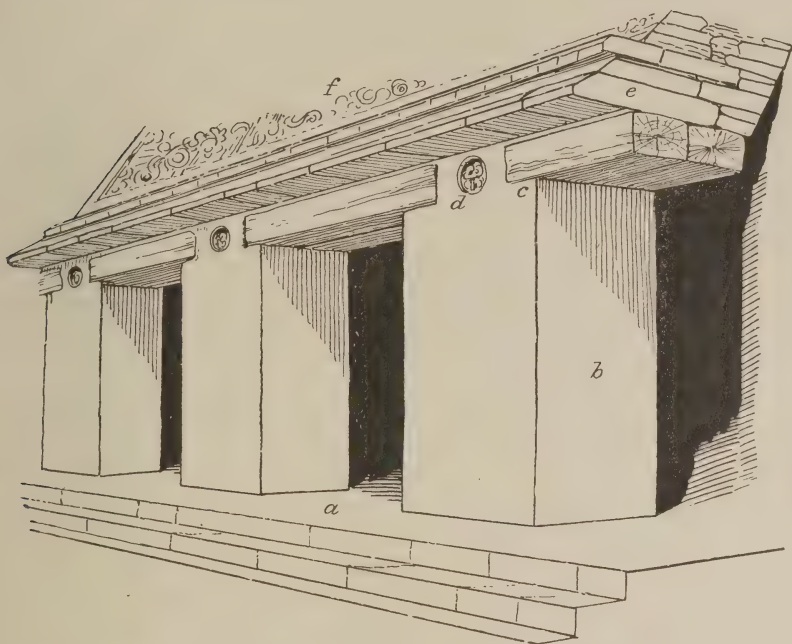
EXTERIOR DOORWAYS AND PIERS WITH WOODEN LINTELS (RESTORED).
